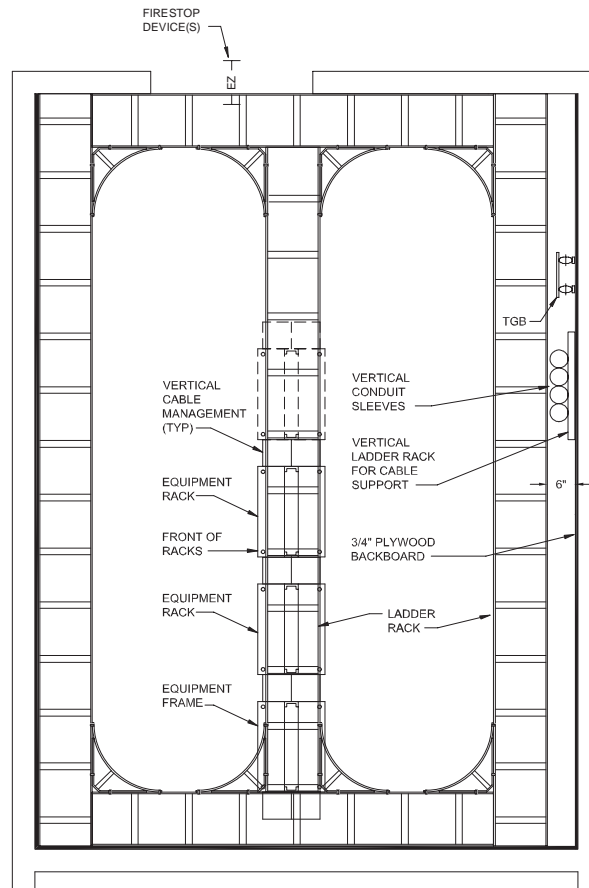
Typical Telecommunications Room (TR) Plan
